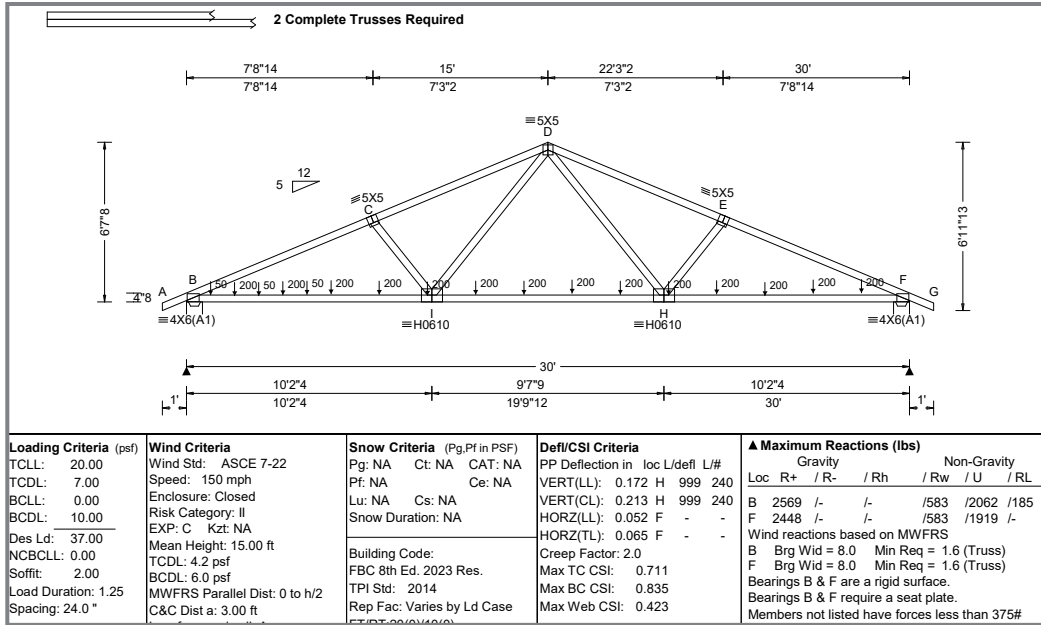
TDD of Girder Truss with Point Loads on Both Faces
